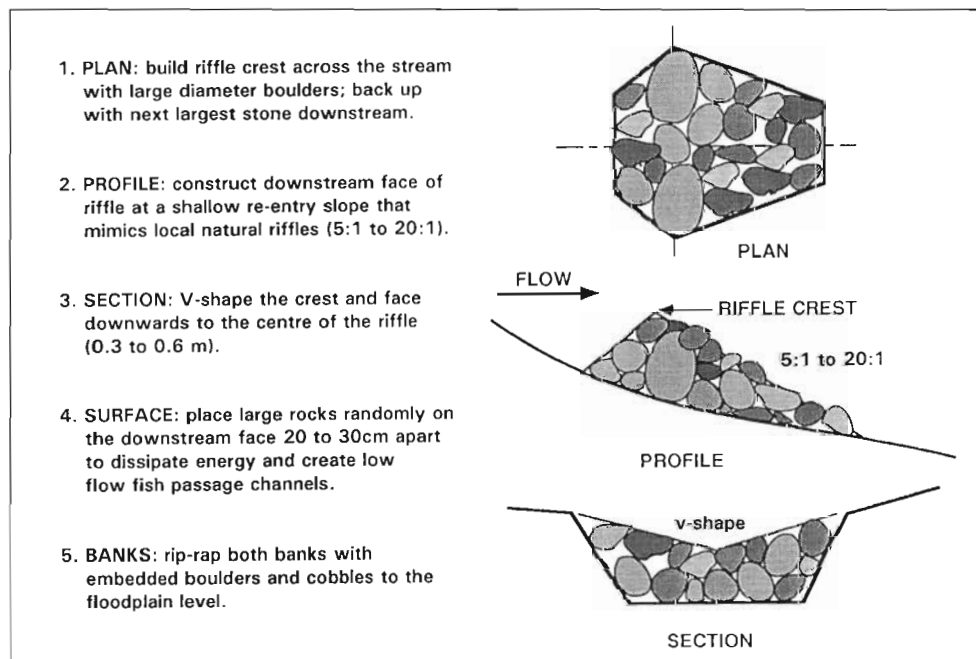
This schematic pool and riffle construction drawing may be augmented for machine operators with notes on the placement of construction survey stakes and photographs of natural and well constructed riffles (video, Newbury Hydraulics 1996).
